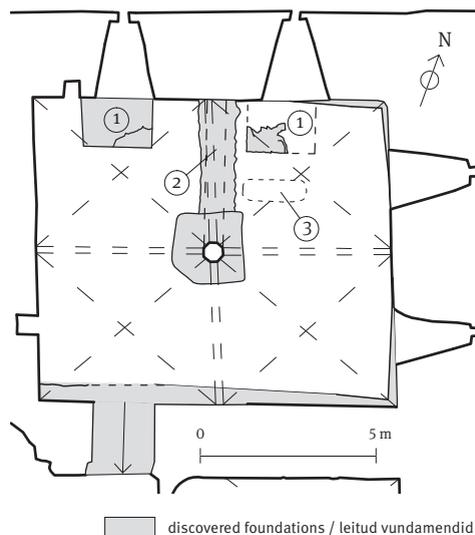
Plan of the undercroft chapel. 1 – foundations of altars, 2 – foundation of partition wall, 3 – site of a burial.
